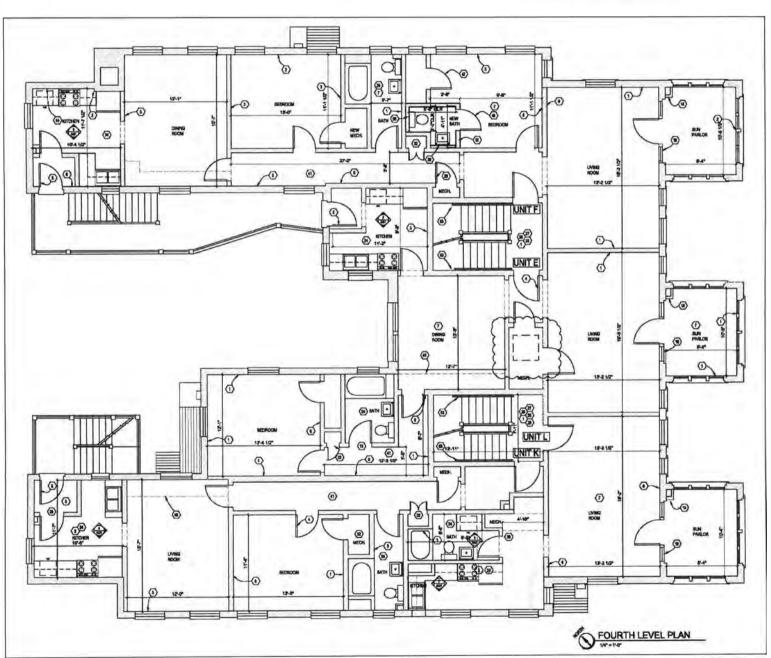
"Third"/fourth floor plan (OPN Architects, Cedar Rapids)
